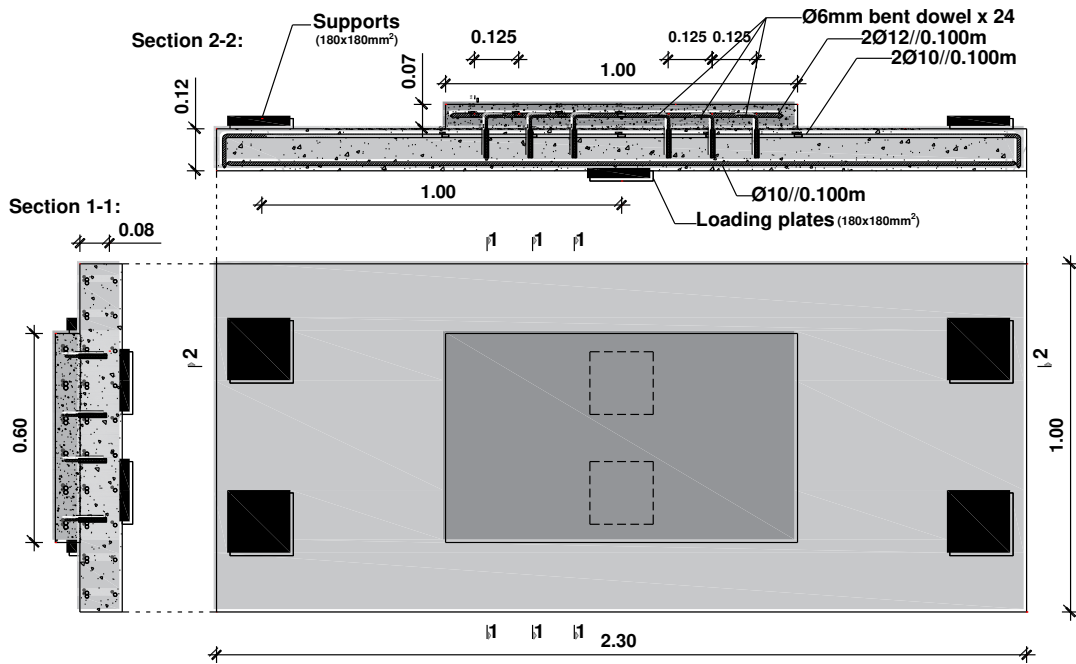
Rebar detailing and strain gauge placing for R<sub>S</sub>-STC specimens.
